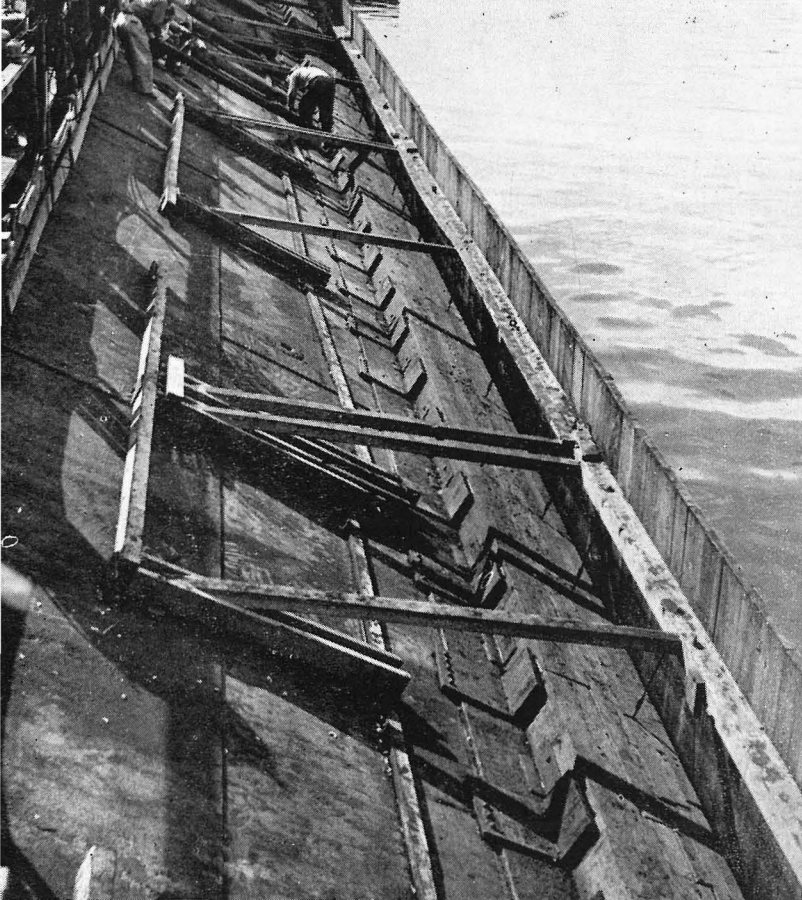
Thrust brackets welded to the bottom along the centerline. Each bracket absorbed the force transmitted by individual compression members, of which there were four for each "A" frame. The cofferdam on the right holds water back during high tide.
